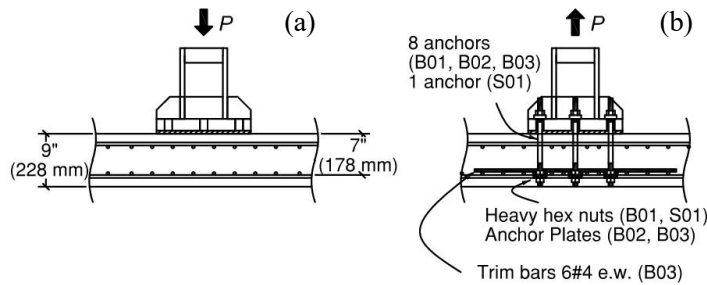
Specimens reinforcement, base plate, and anchor bolt detailing. (a) Punching shear specimen P01; (b) Breakout specimens B01, B02, B03 and S01.
